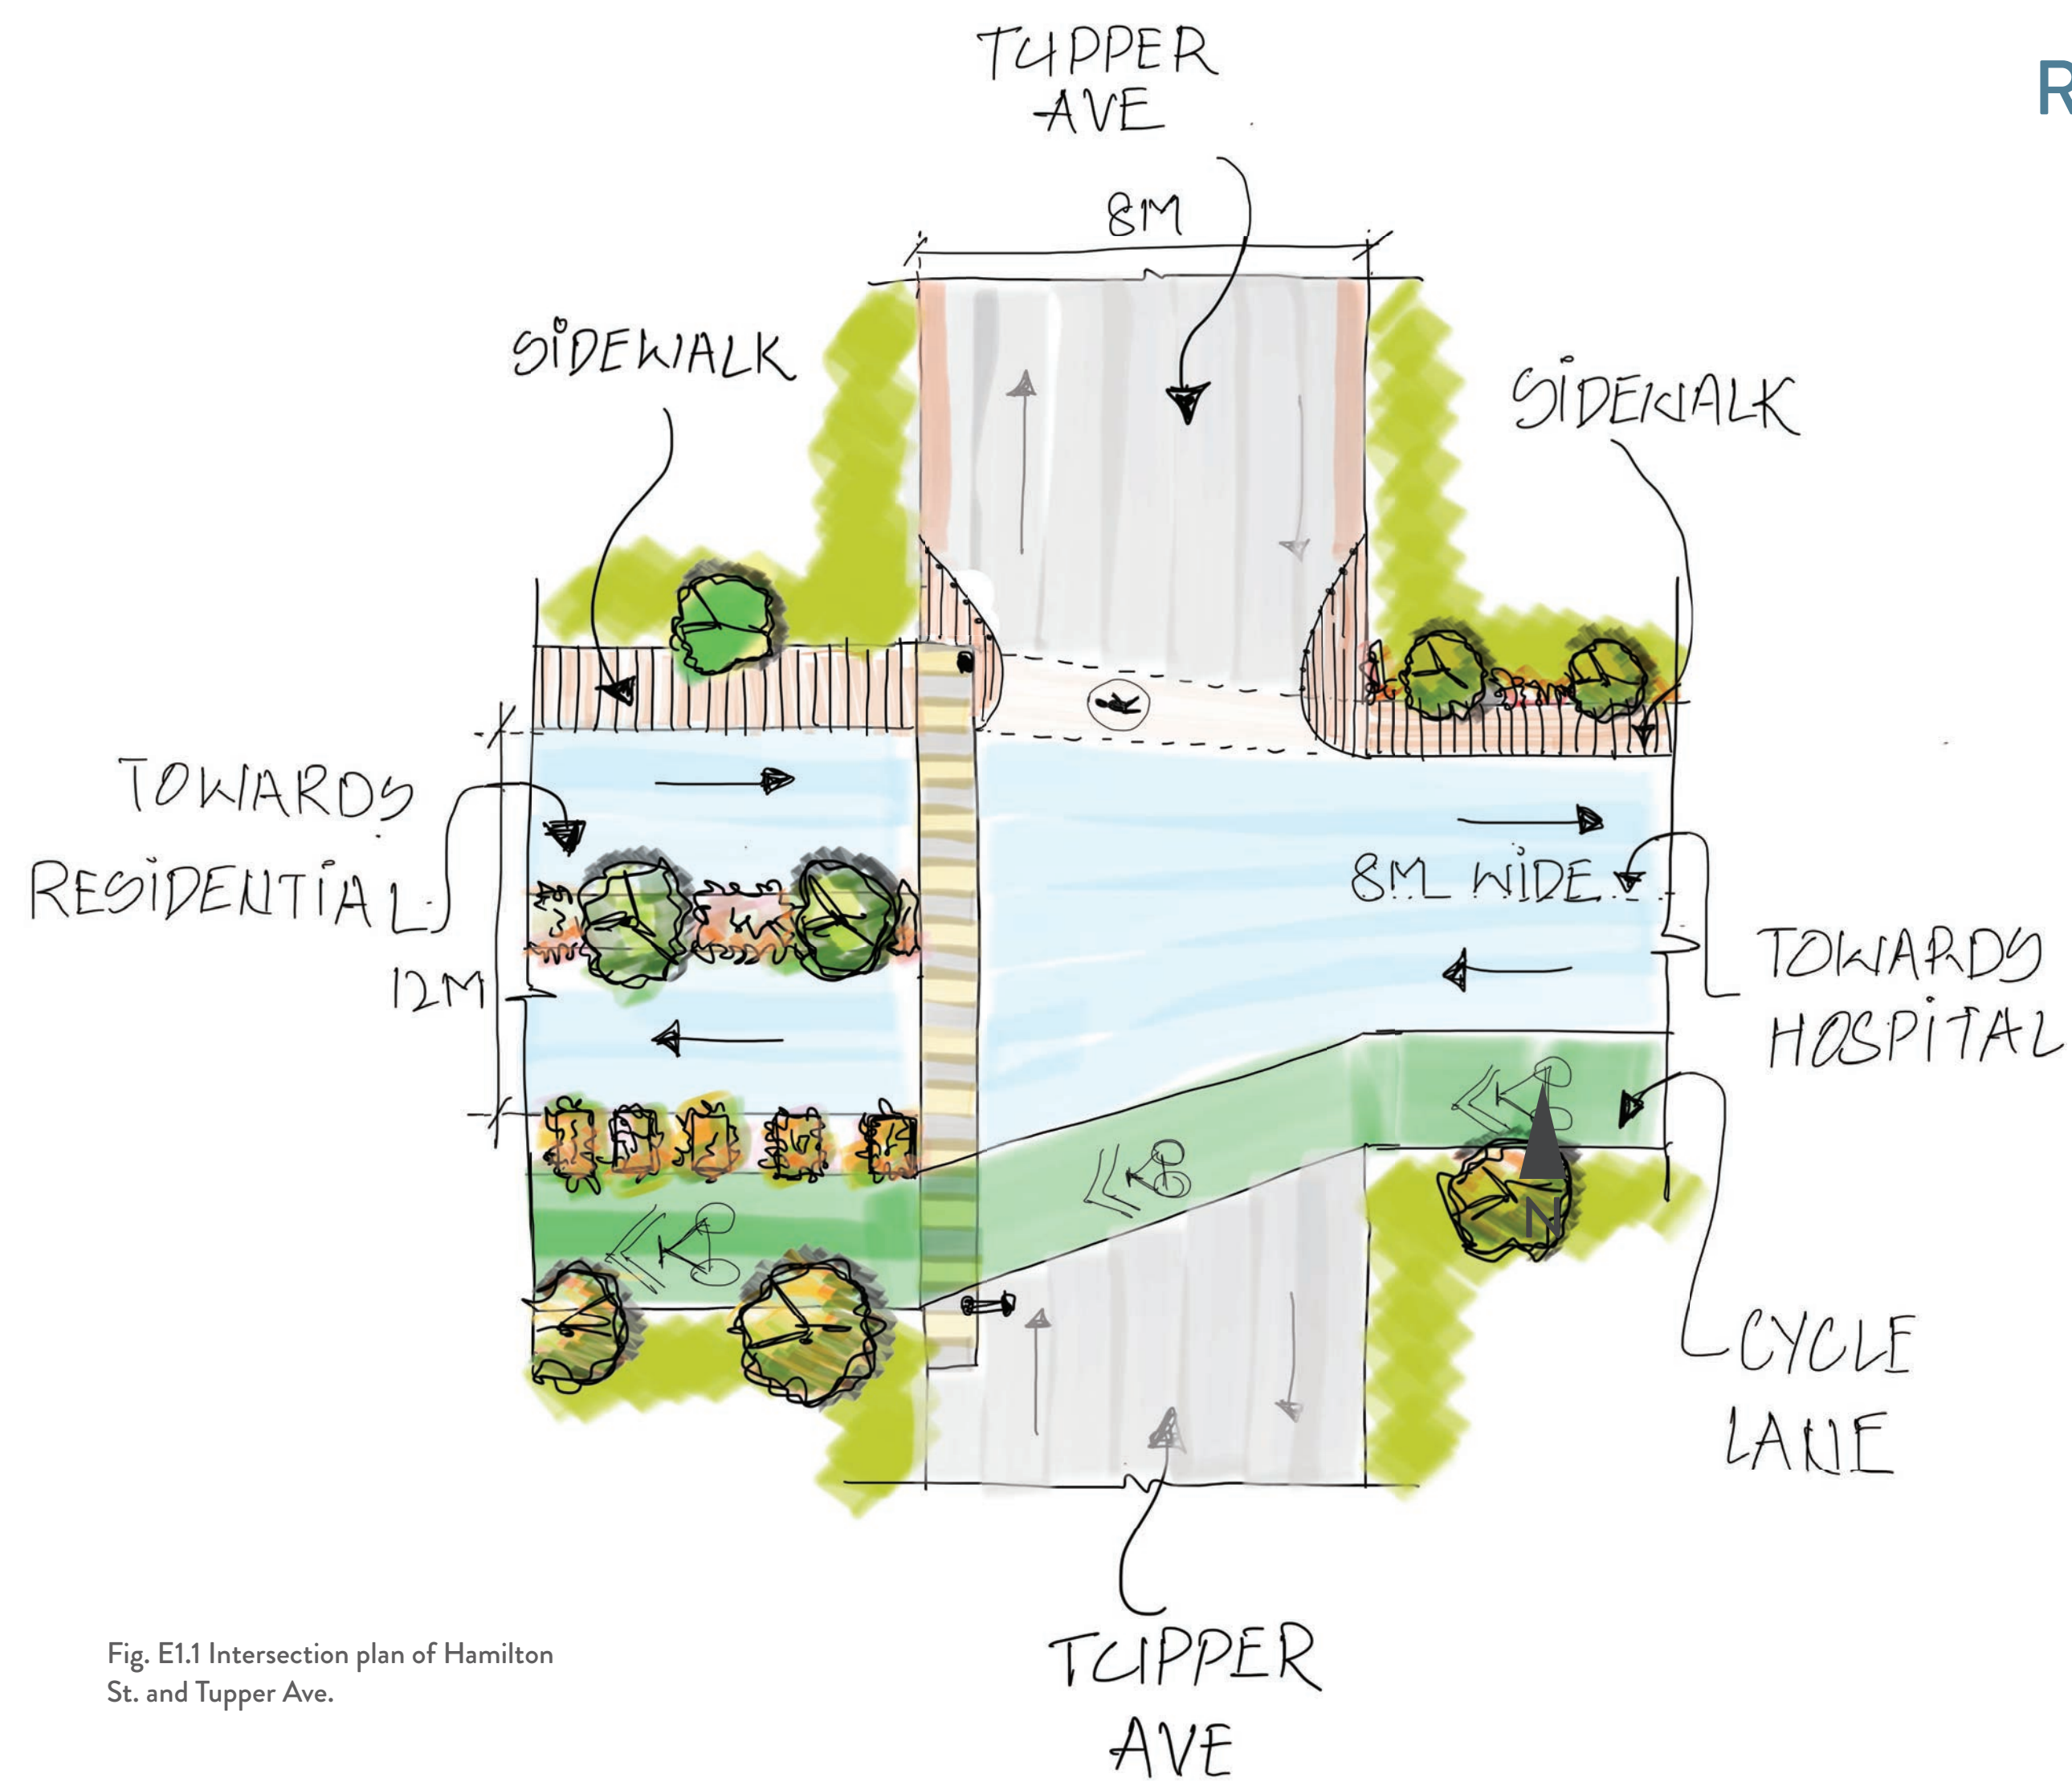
Intersection plan of Hamilton St. and Tupper Ave.
